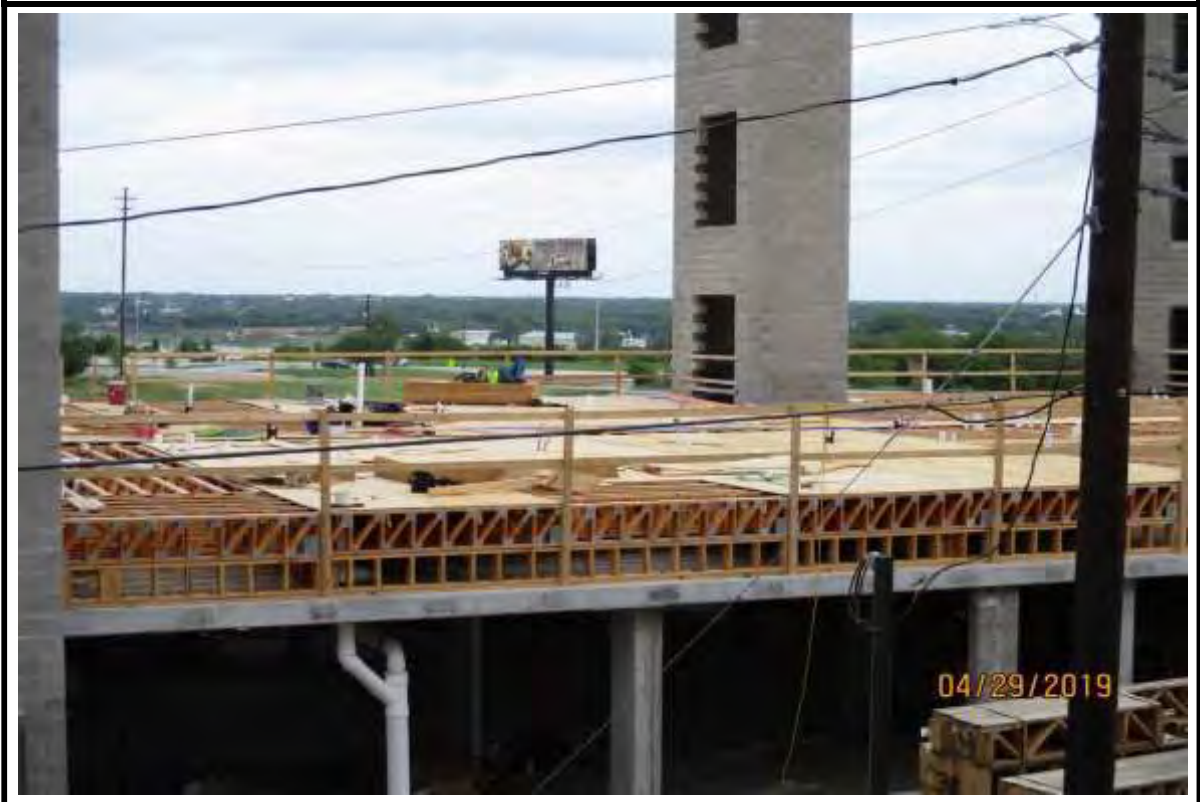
Wood framing to 4<sup>th</sup> floor at Building "A".
